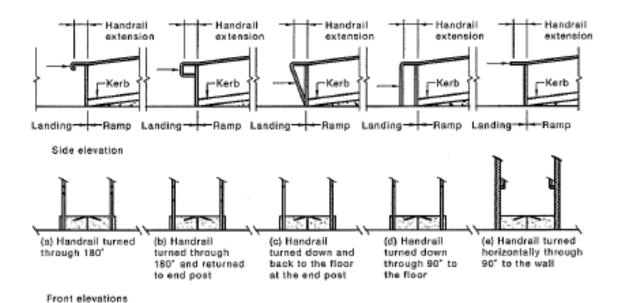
(A) RAMP HANDRAILS-EXAMPLES OF HANDRAIL TERMINATIONS
